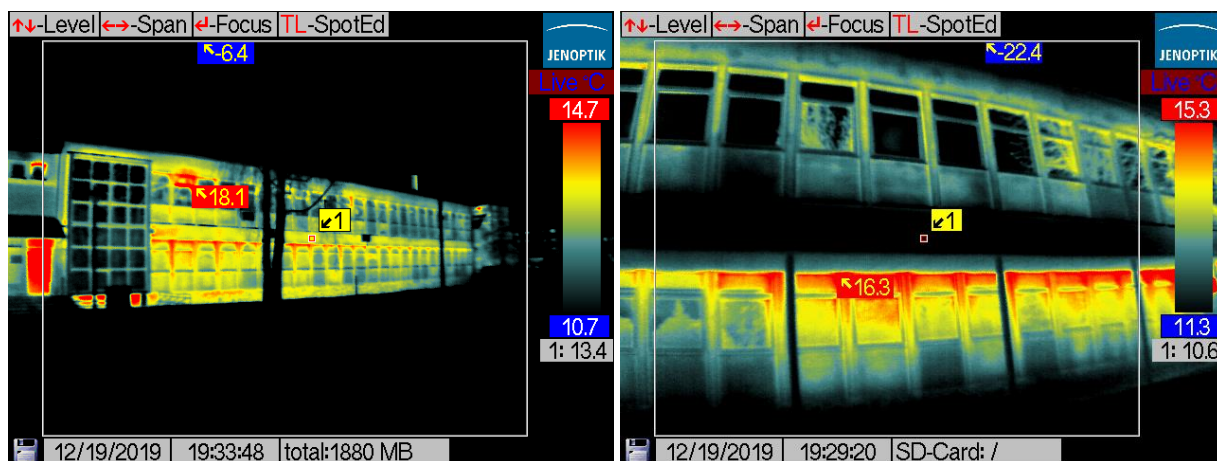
Thermal bridges around windows on south and north side of the building and junction between floors on the north side of the building
